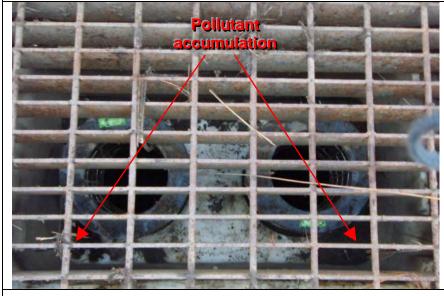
Second storm drain inlet near road sweeper washing area. Inlet is just out of the picture to the bottom left of Photograph 3.
